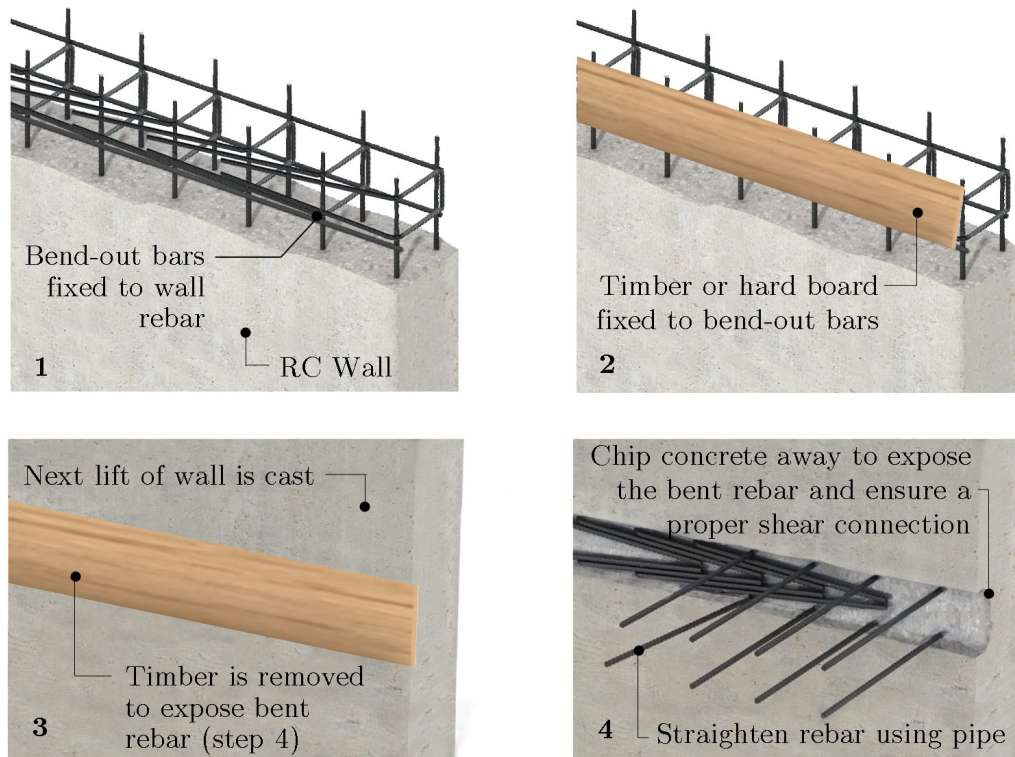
Site-installed Bend-out Bar System (reworked from Ancon Building Products (2011))
